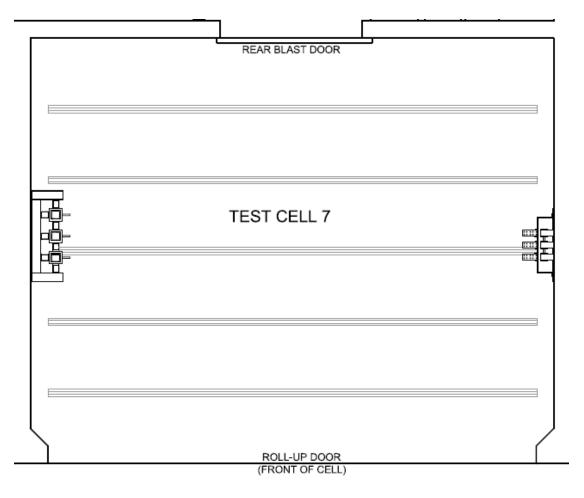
Plan view of Test Cell #7. Low-voltage power connections located on right side of drawing.
